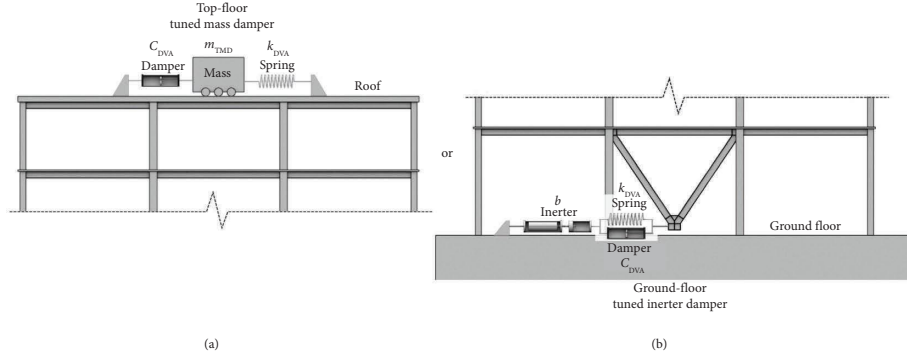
Schematic illustration of (a) top-floor tuned mass damper and (b) ground-floor tuned inerter damper.
